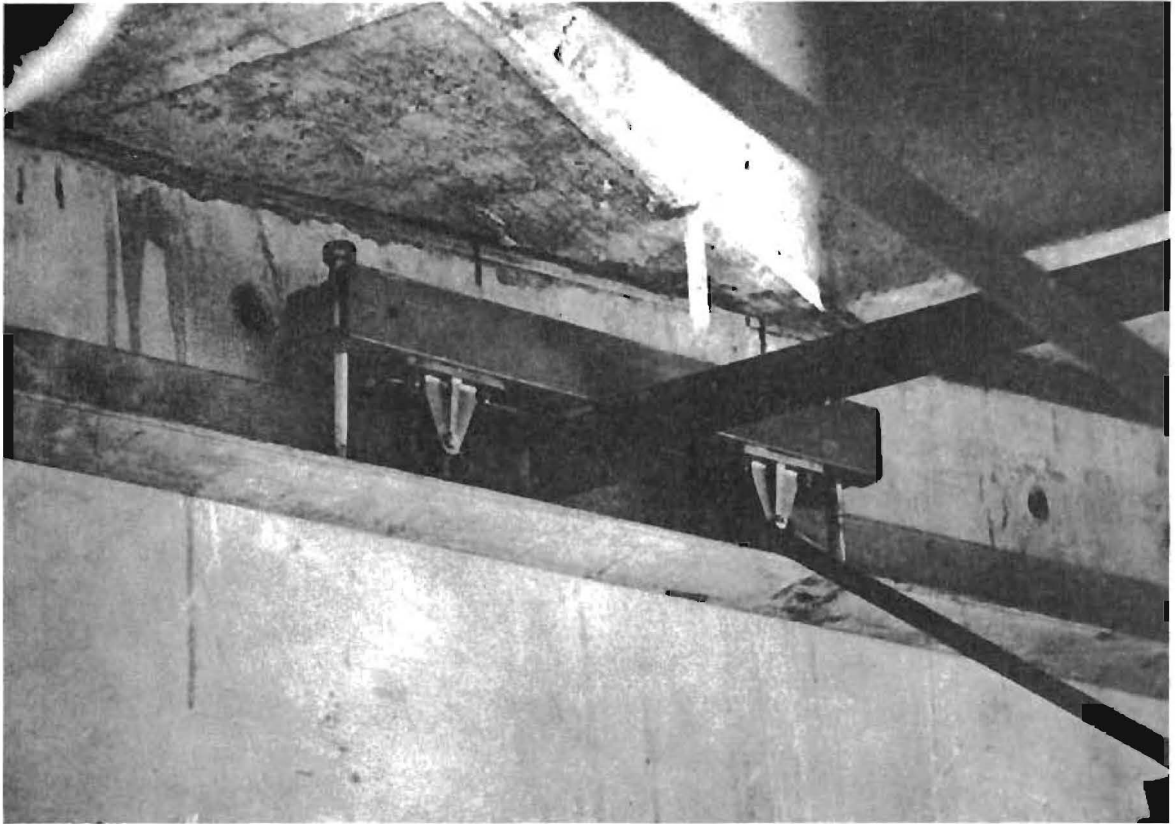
DEFLECTION BRIDGE ROLLER SYSTEM
